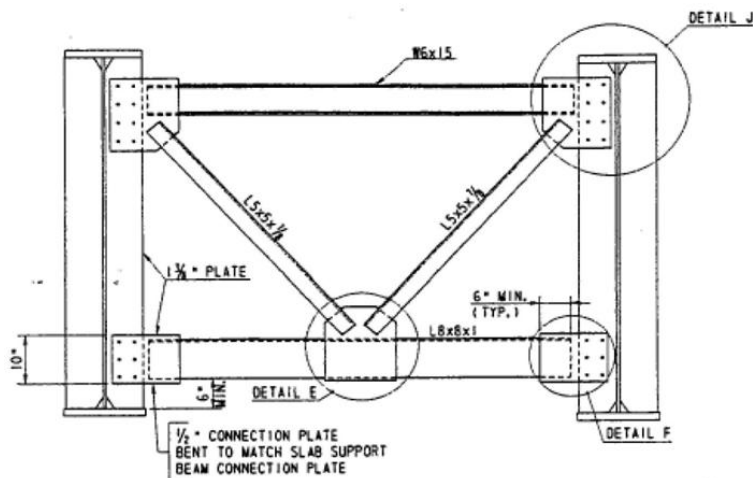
Typical Cross Frame Detail [Winterling 2007]
